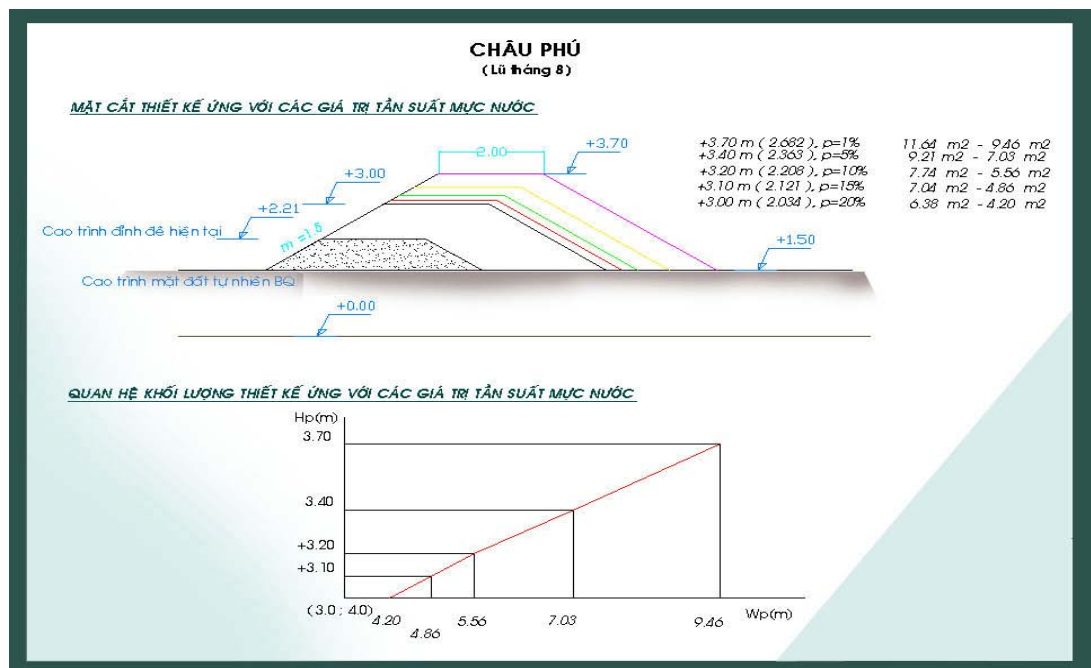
Typical cross-section of embankment for Chau Phu district
